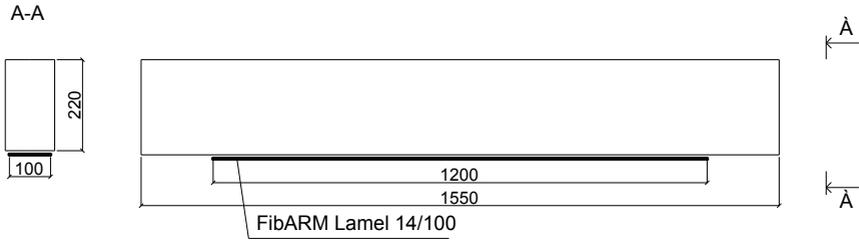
Reinforcement structure of the reinforced concrete beam with FibARM Lamel 14/100
